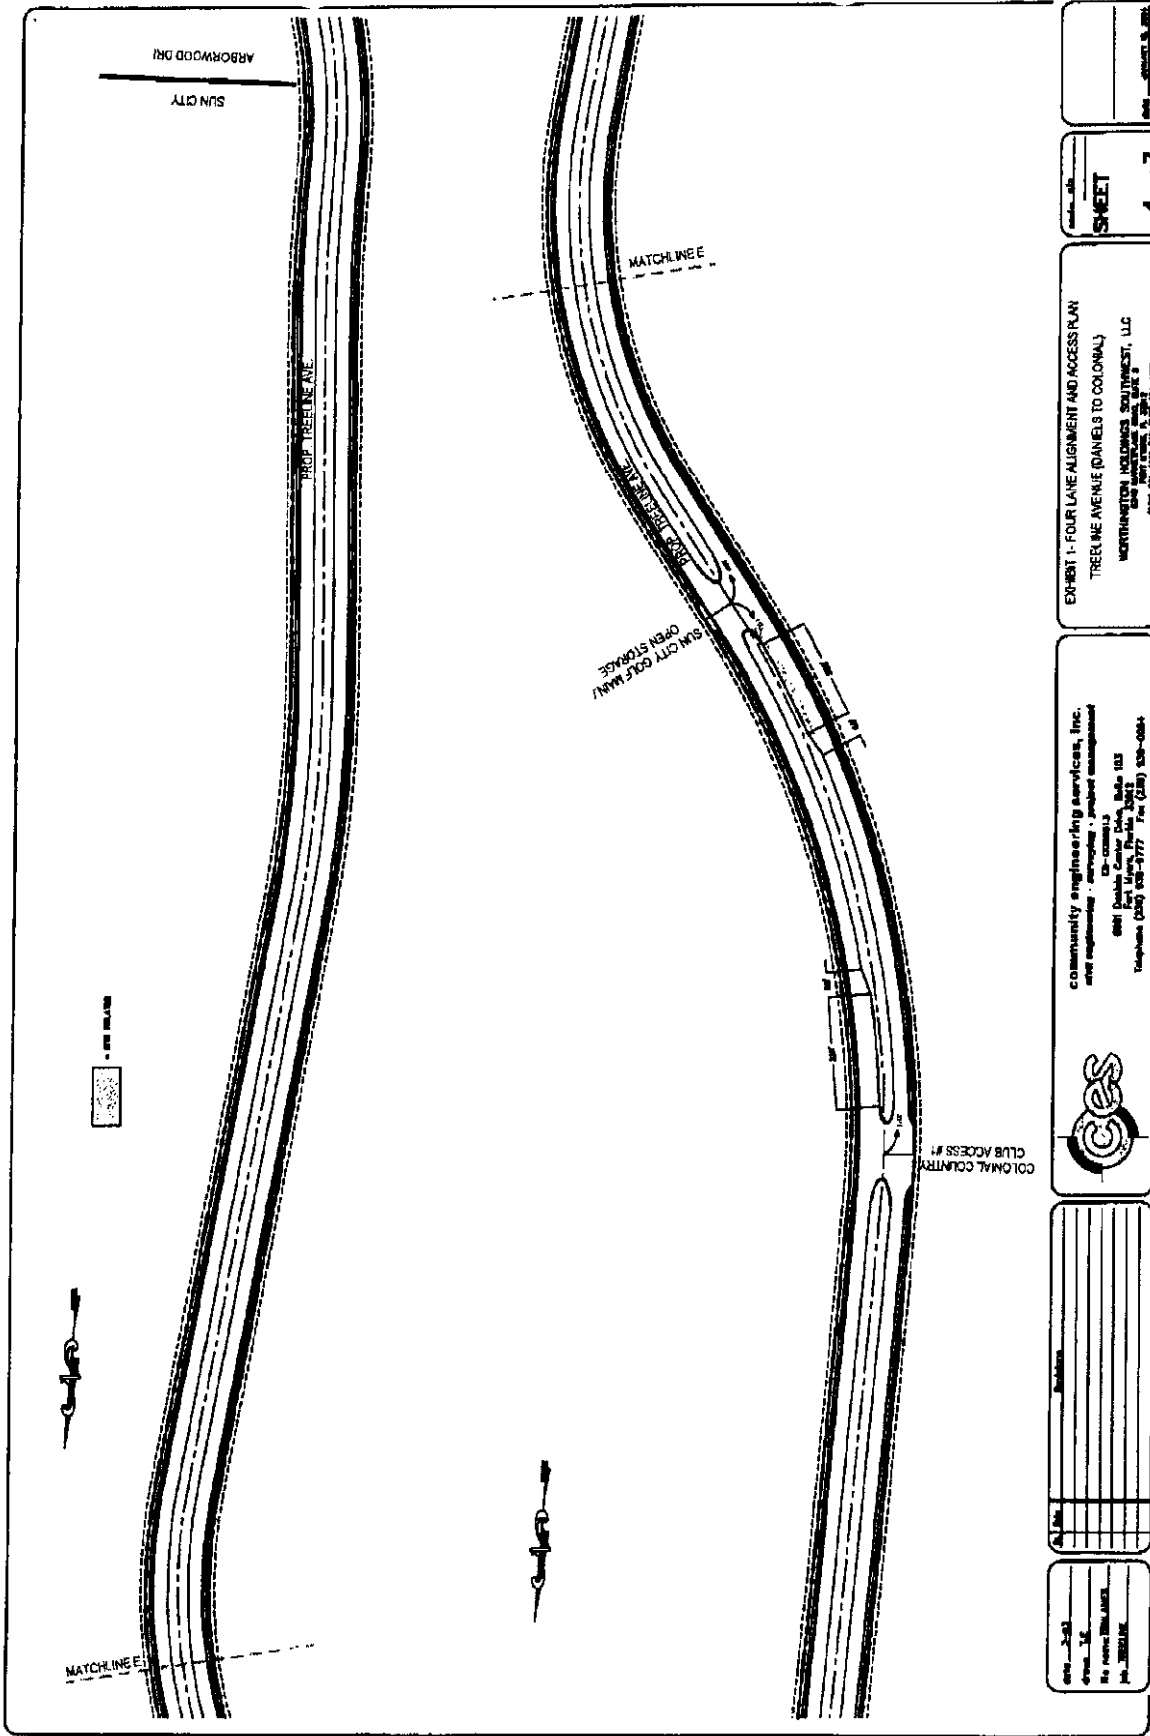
EXHIBIT I-FOUR LANE ALIGNMENT AND ACCESS PLAN
